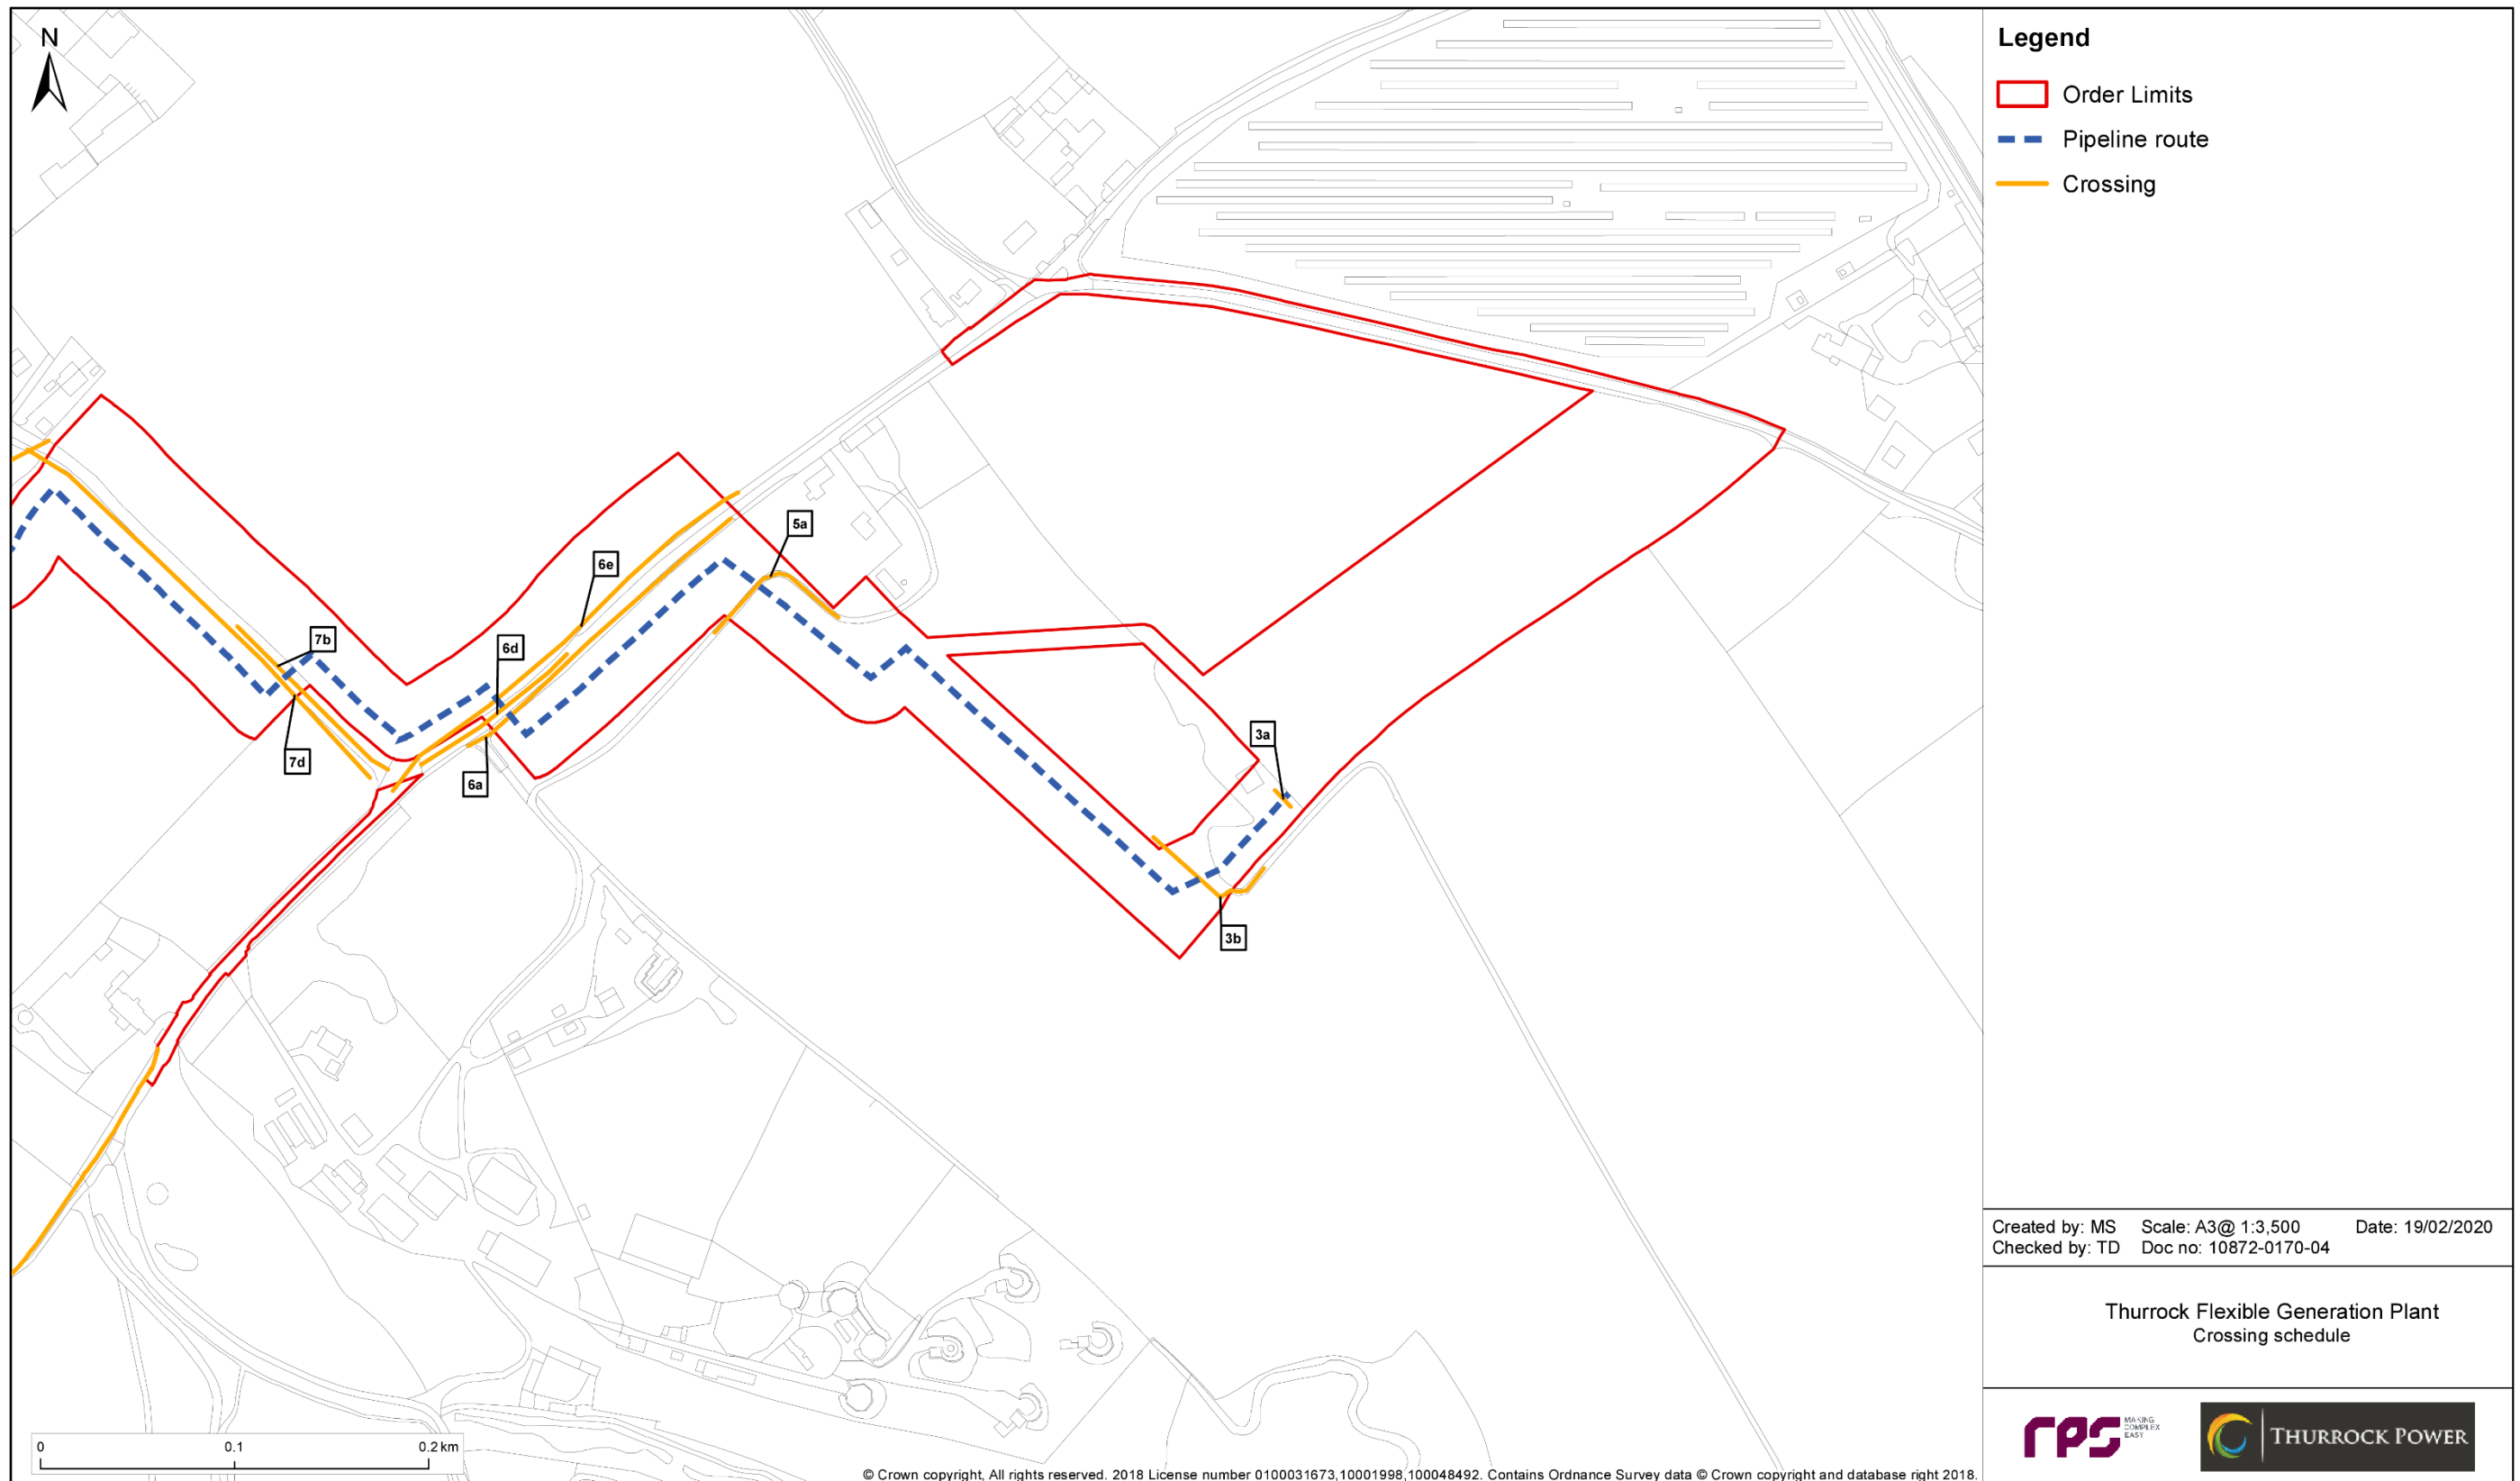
Gas pipeline, underground cable and access road crossings – sheet 1.
